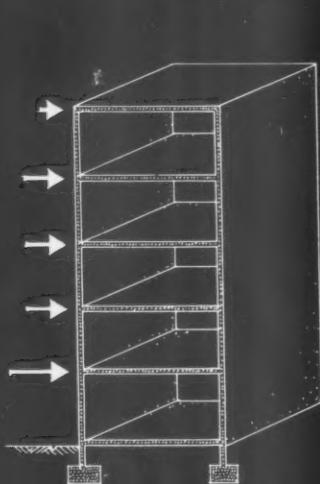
TALL &amp; NARROW BUILDINGS.
